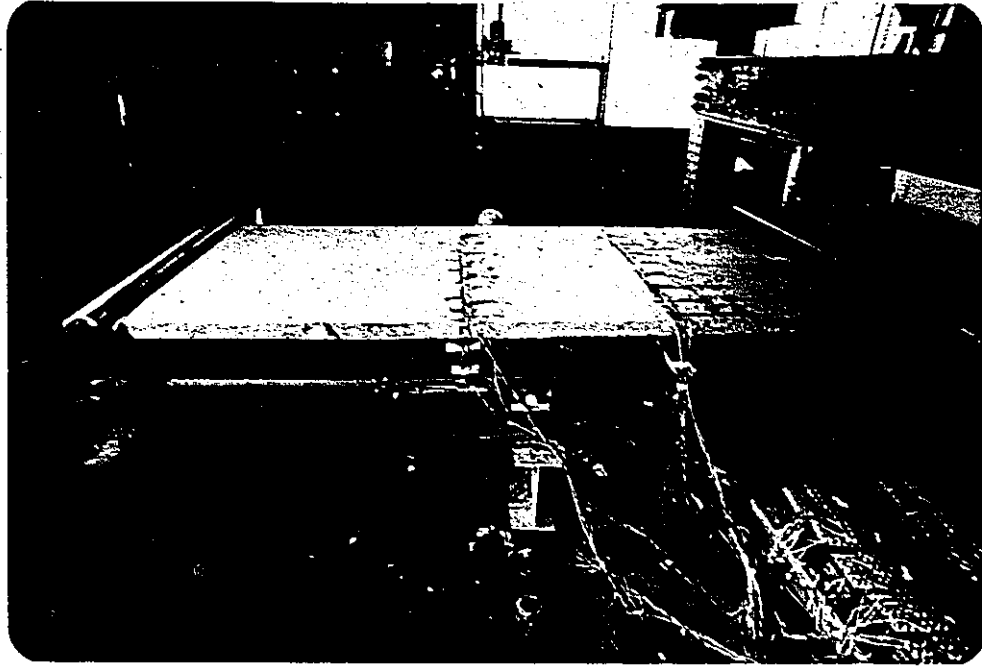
A VIEW OF THE CONCRETE SLAB AFTER CASTING, BRIDGE MODEL I.
